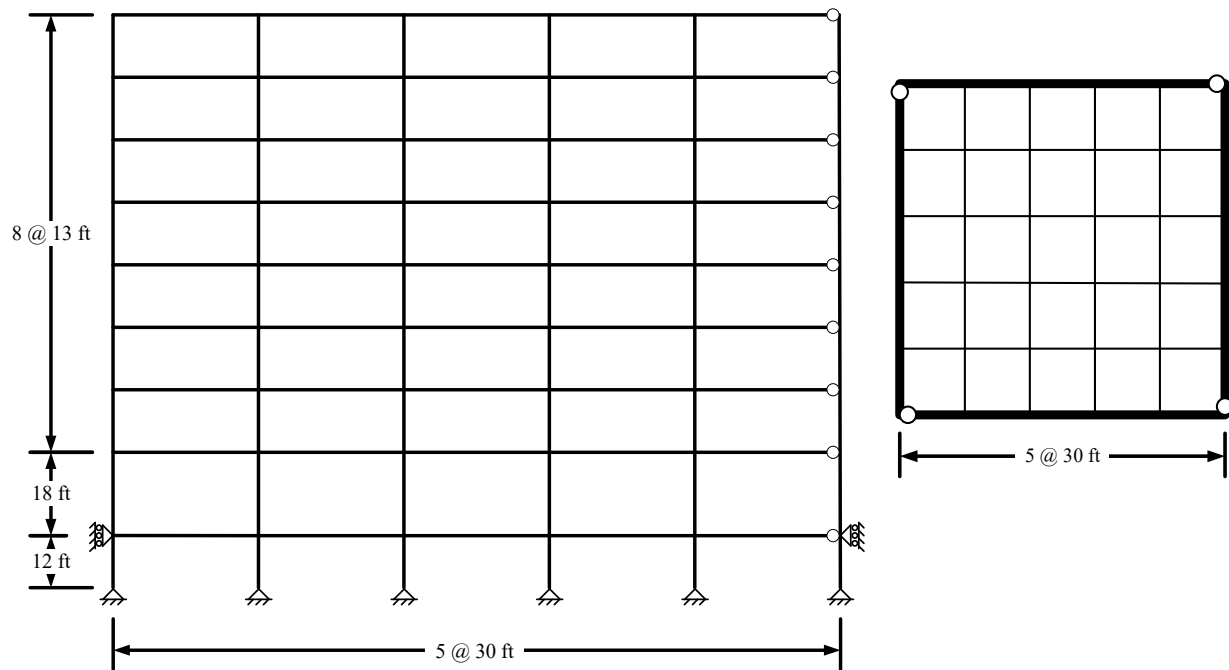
Los Angeles Building Elevation View (left) and Plan View (right) (FEMA, 2000)
